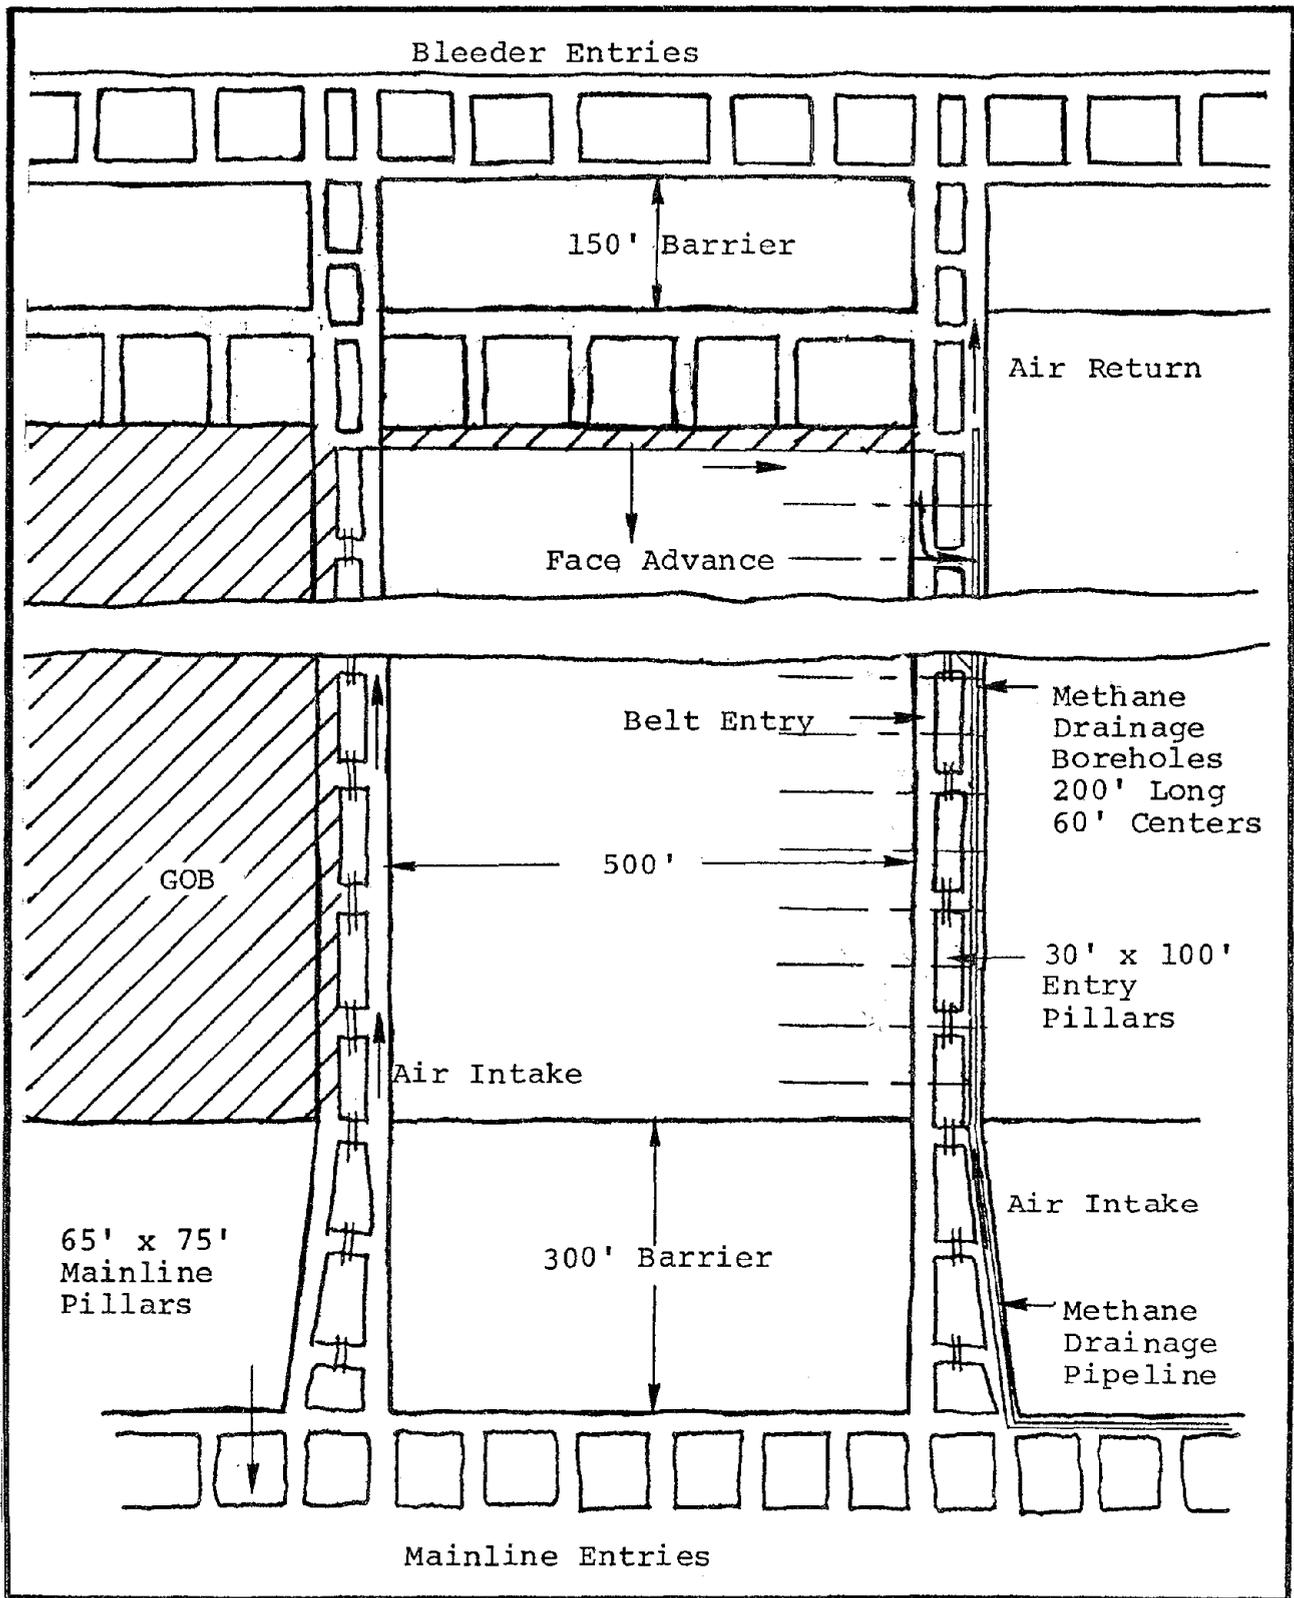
Longwall 2-Entry Development Plan for SUFCo Mine
